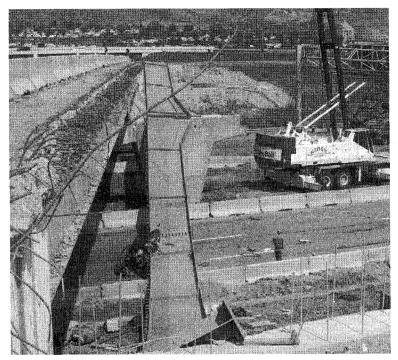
C-470 Bridge steel girder under construction collapsed on eastbound vehicle on I-70 near Golden, Colorado.⁴⁶
